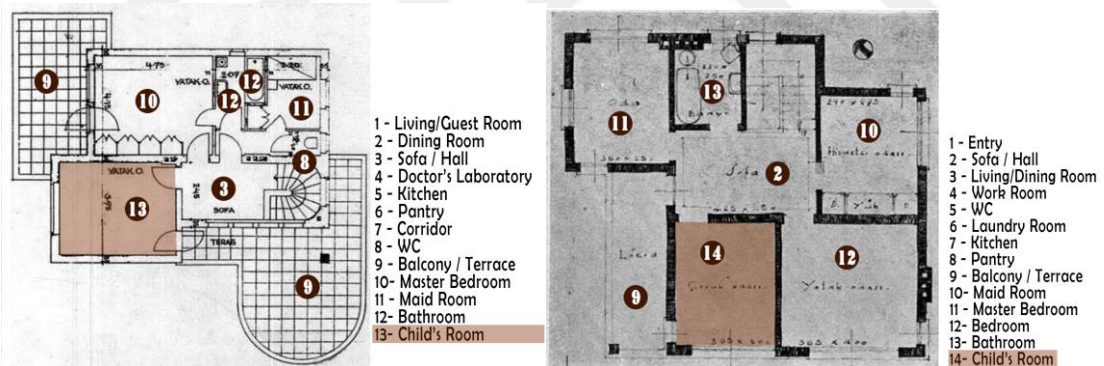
(left) The upper floor plan of Dr. Celal House, Ankara (*Mimar*, 1932, 10); and (right) the upper floor plan of Mrs. Feride House, İstanbul (*Mimar*, 1933, 1)
